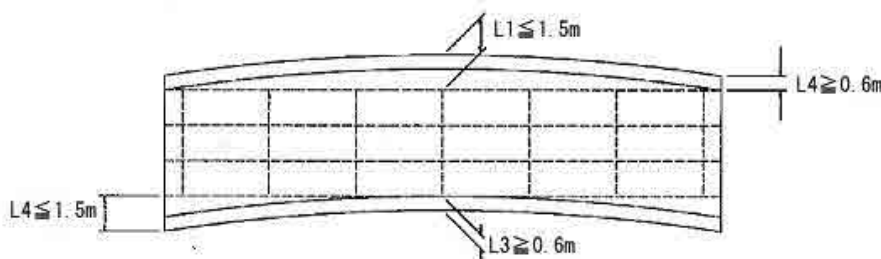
Amount of Floor Slab Overhang on a Curved Bridge
